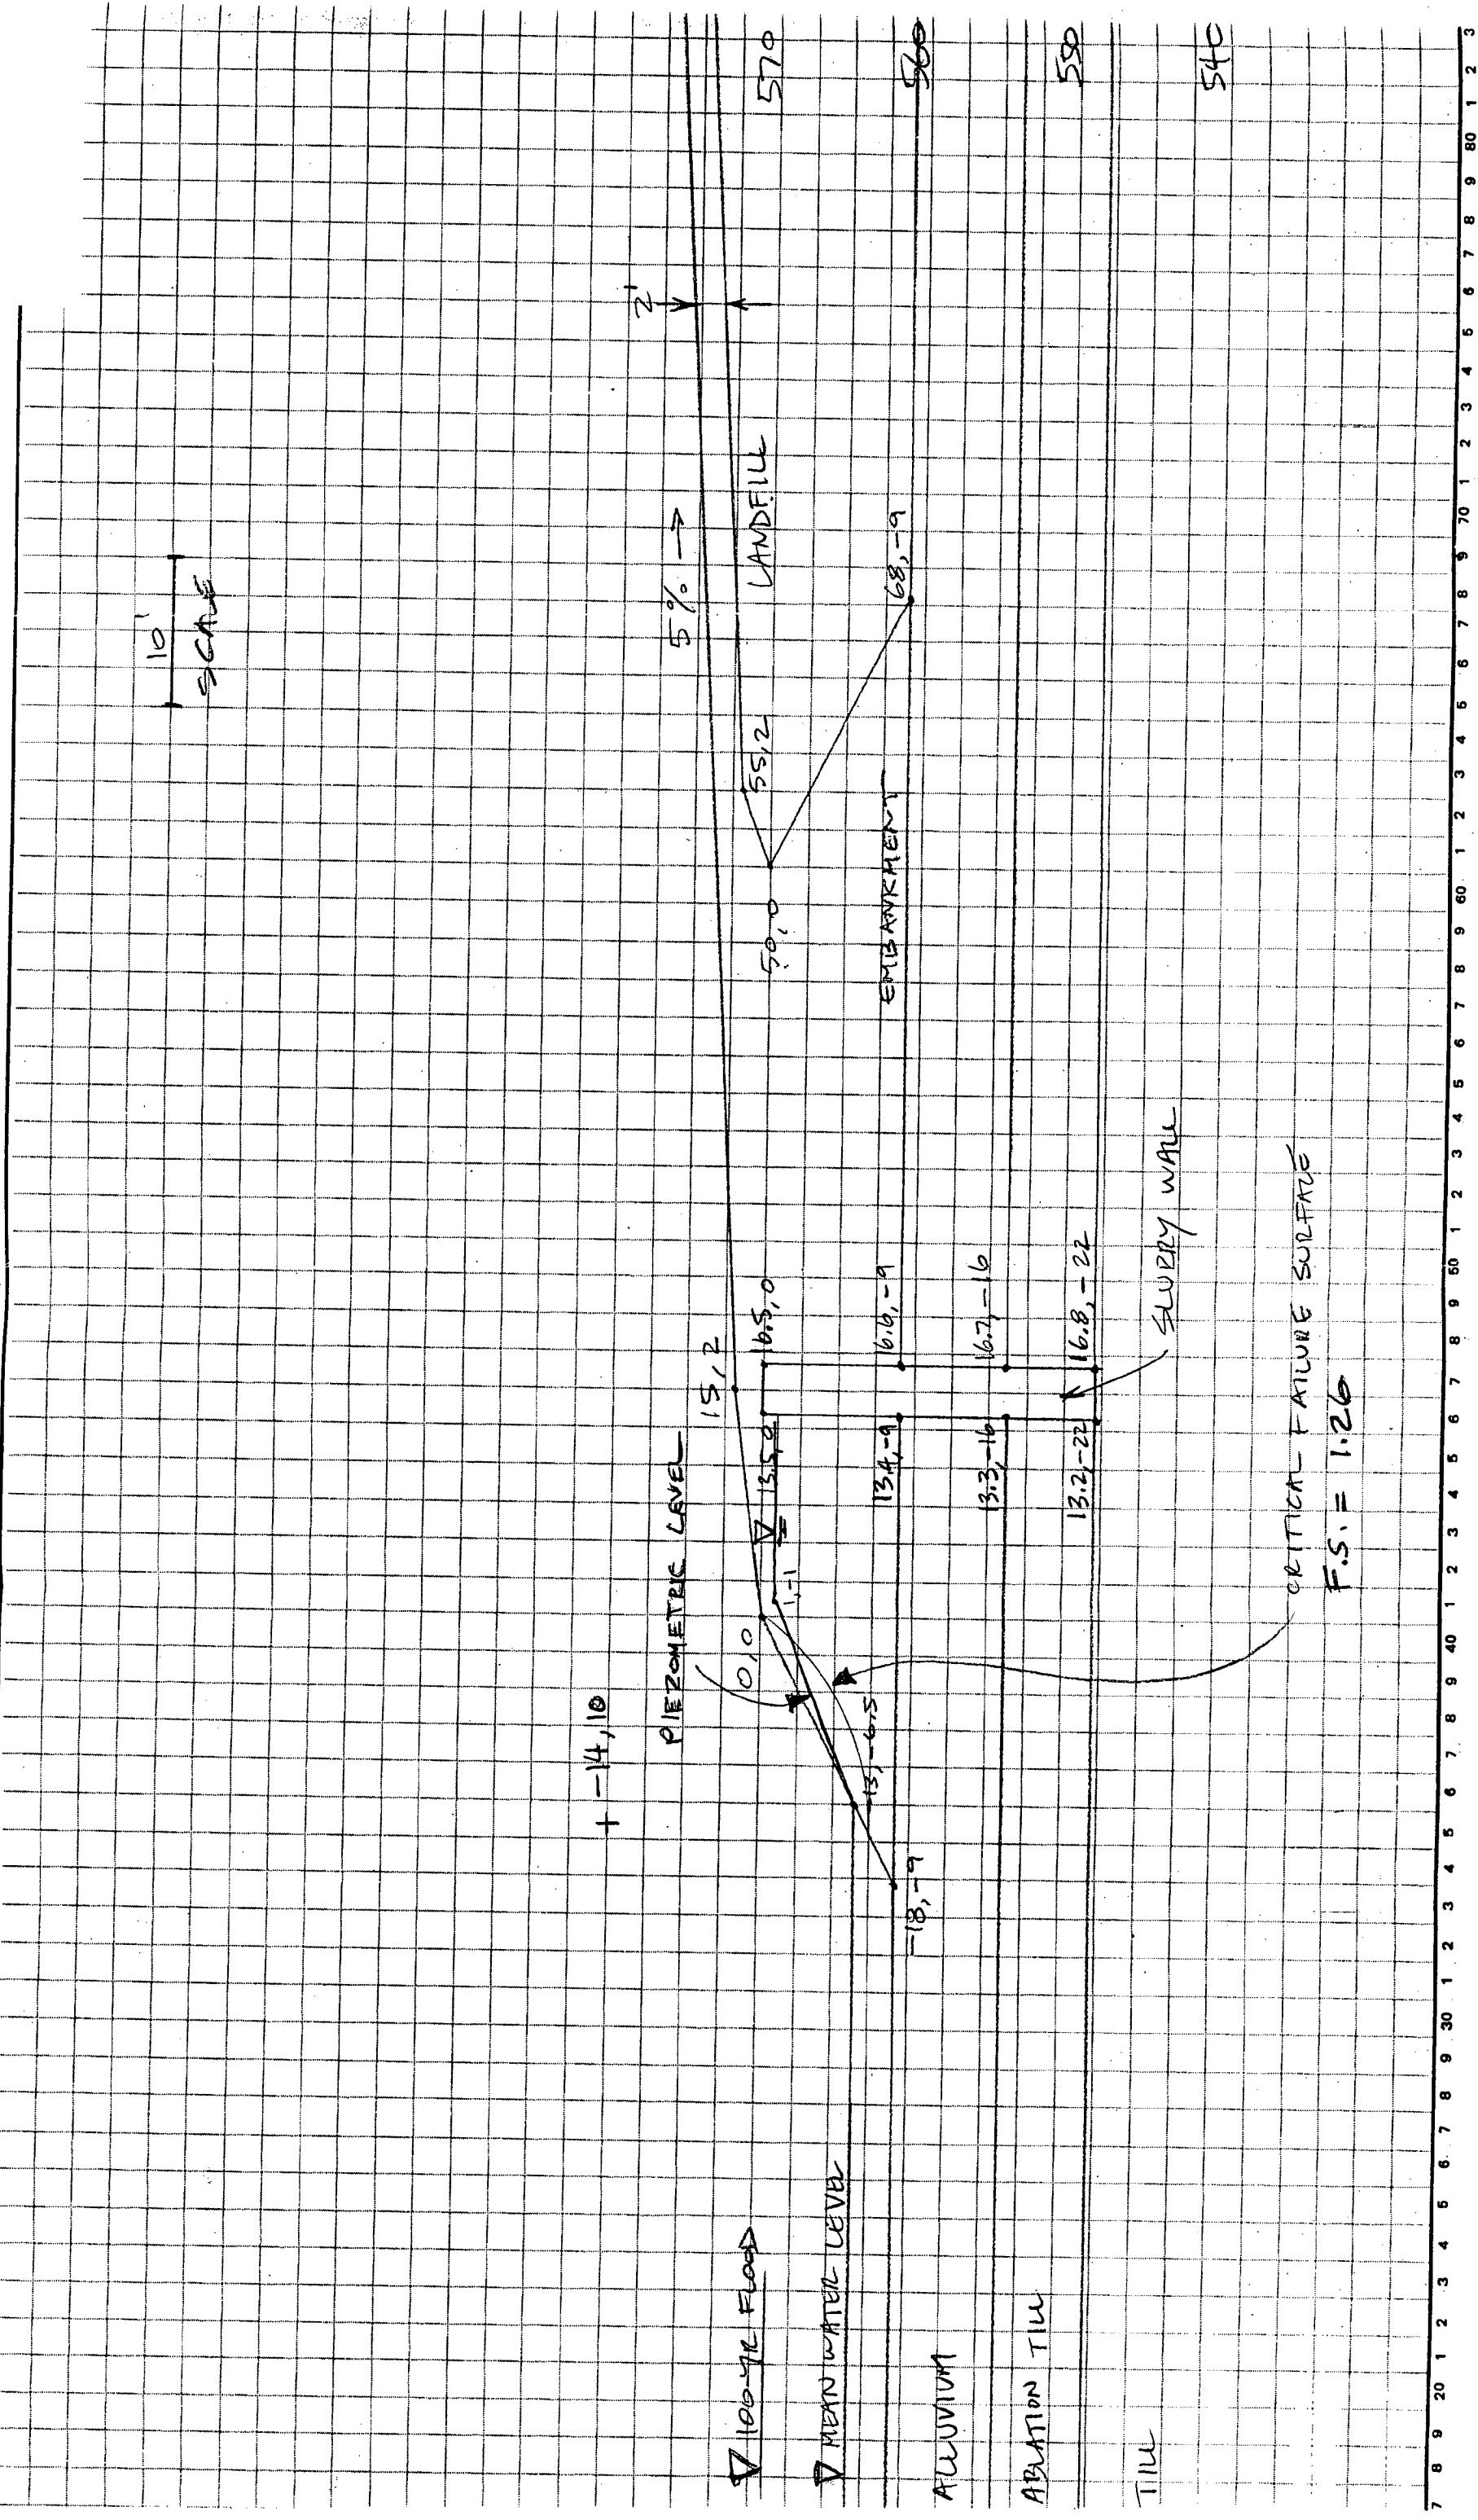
BULLEHEAD, WEST END OF OXYCHAM PROPERTY, CROSS-SECTION NO. 3
